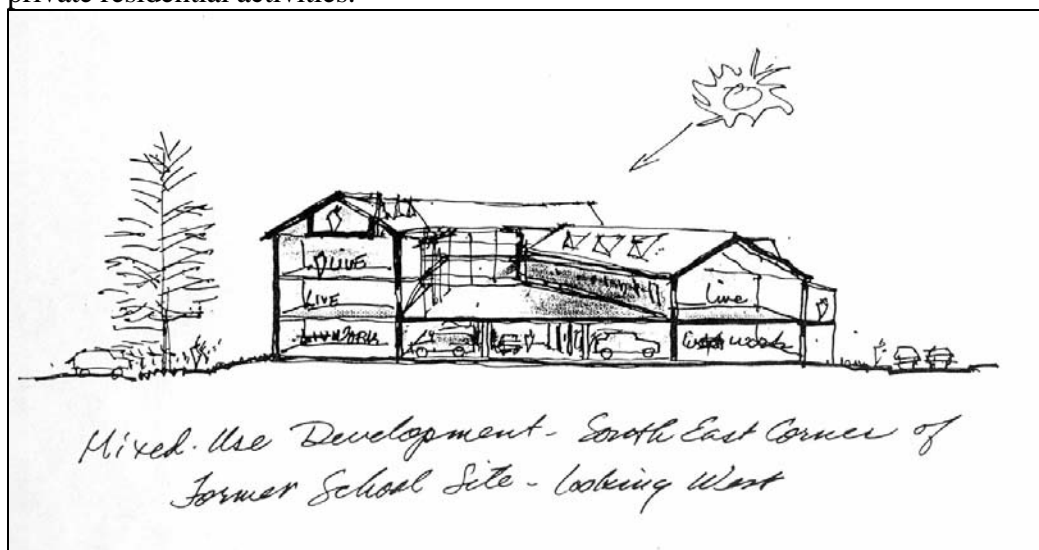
Mixed Use Development South-East corner of former school site-looking west
